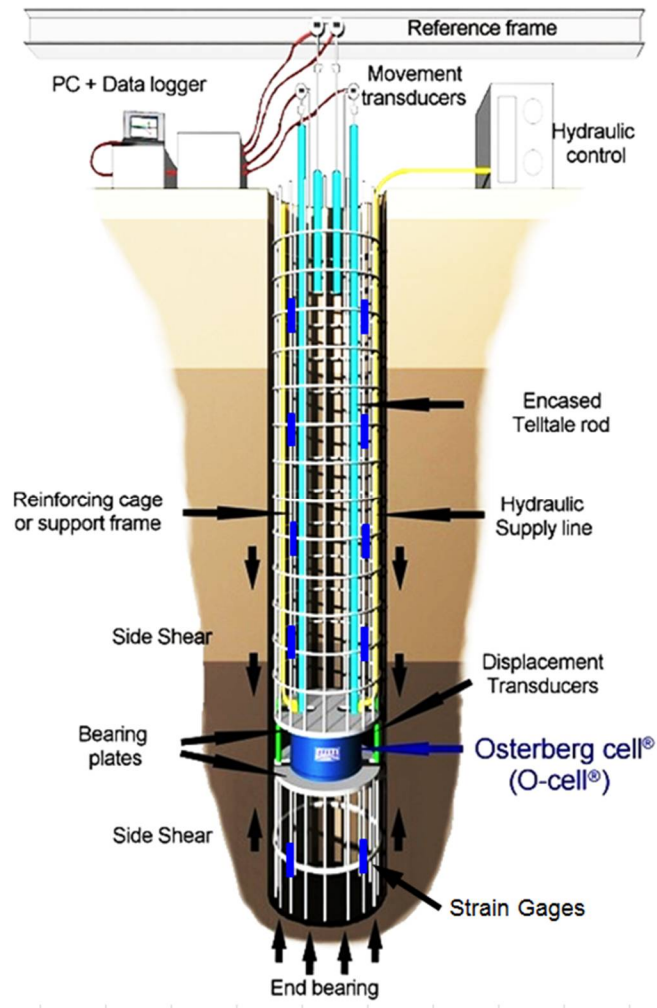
Instrument scheme for a bidirectional load test ([www.Loadtest.com](http://www.Loadtest.com))
